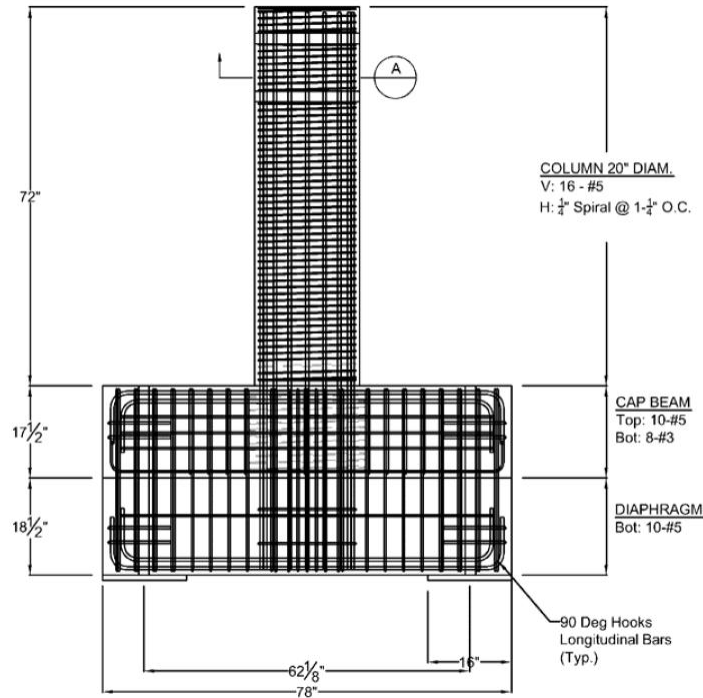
Specimen CIP-CB-REF elevation (Pang et al. 2008)
